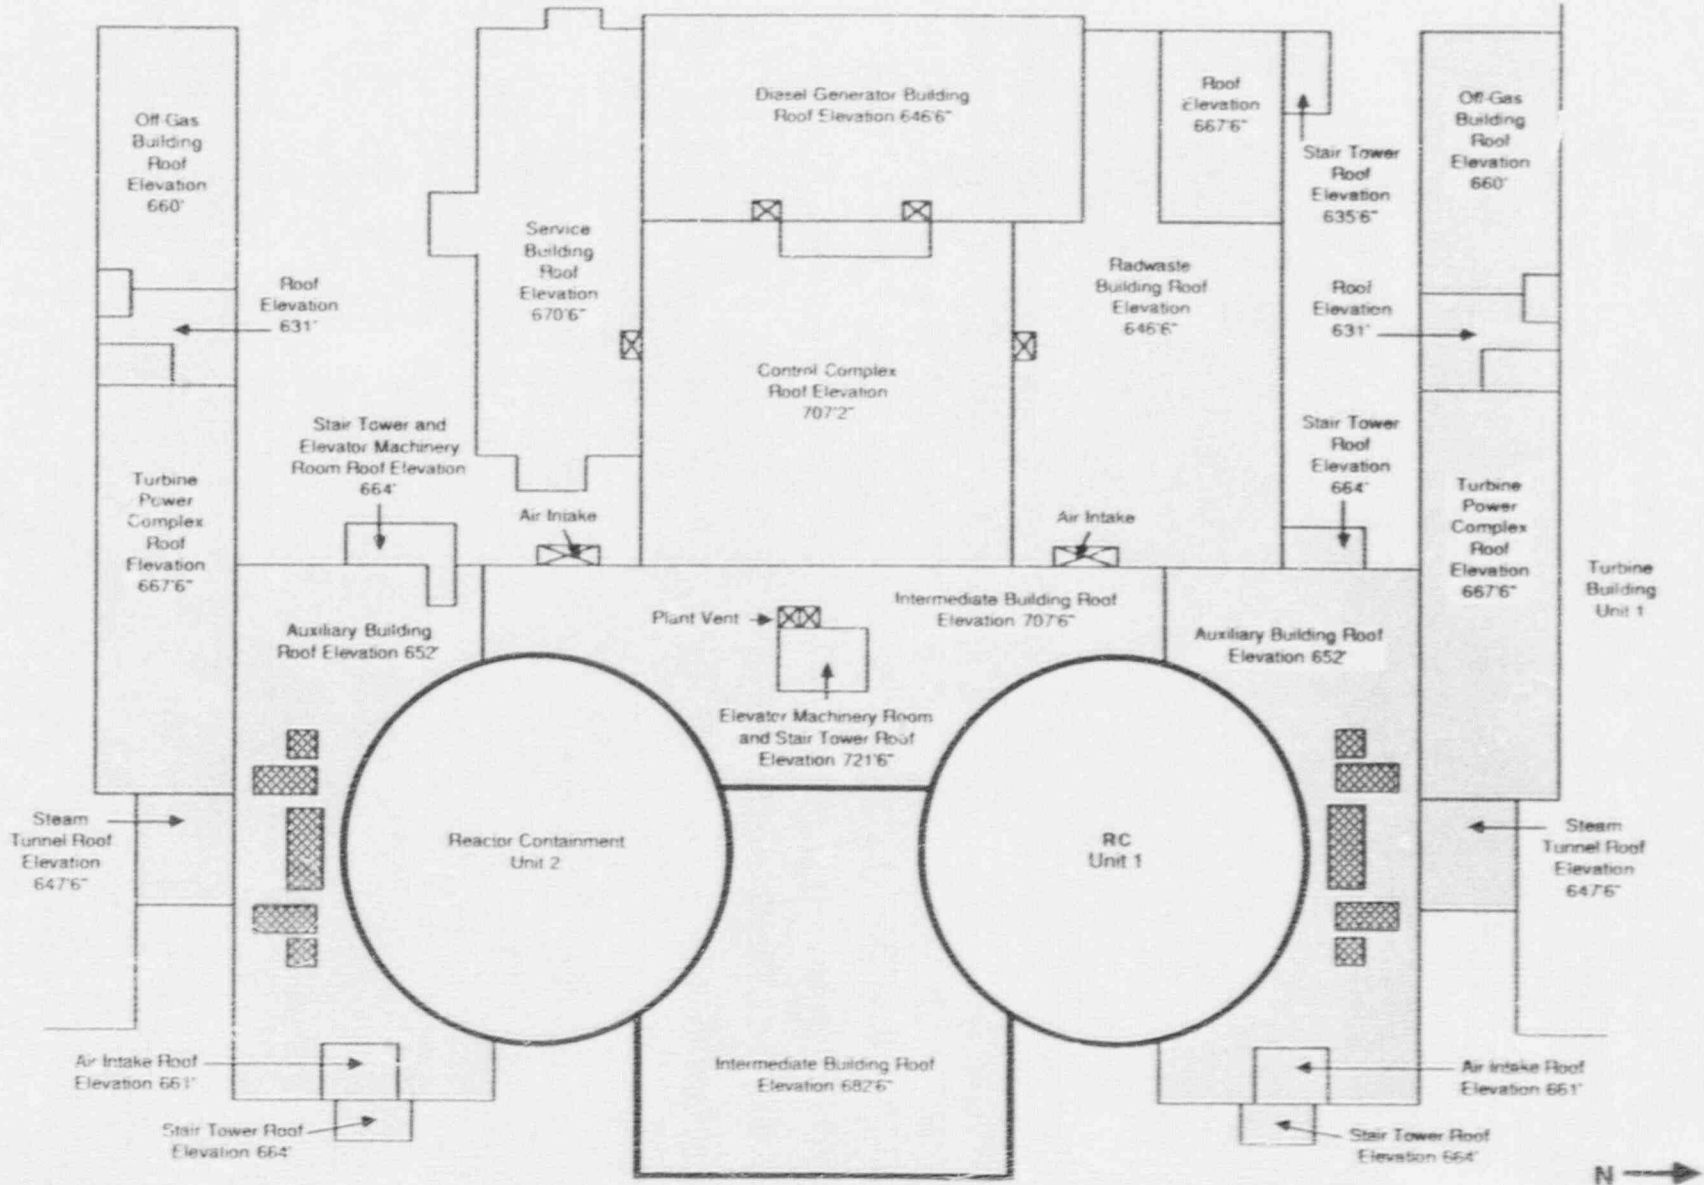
Perry 1 and 2 Reactor Building, Auxiliary Building, and Intermediate Building Roof Plan
